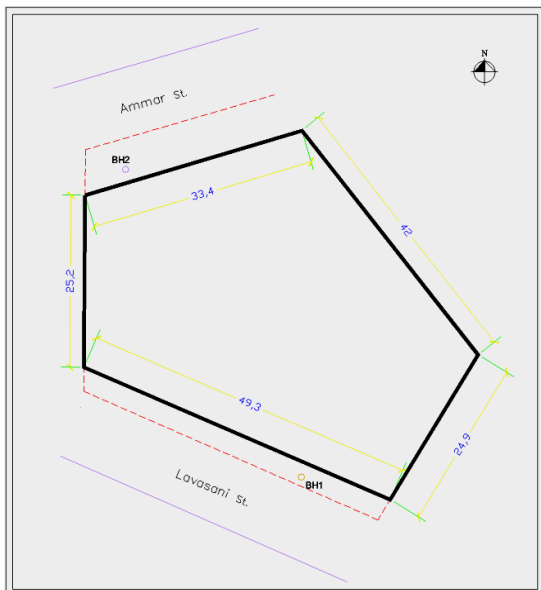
Site Plan of Roshha Project (Dimensions in meter)
